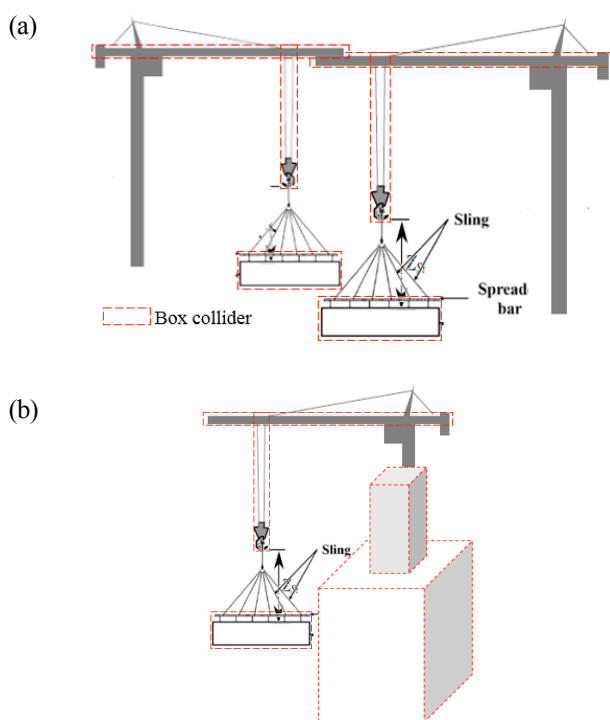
Mechanisms of collision detection. (a) Tower crane to tower crane (T2T); and (b) module to building (M2B).
